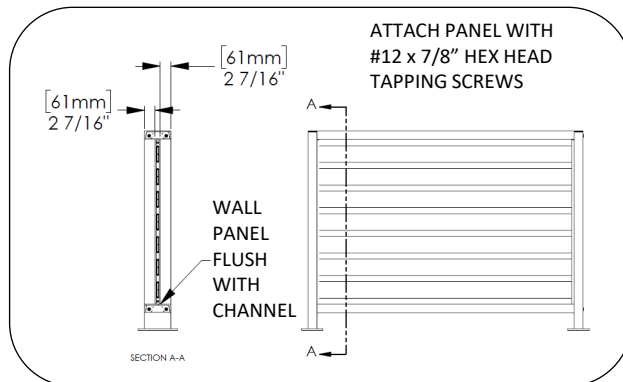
ATTACH HORIZONTAL SLAT WALL PANEL
